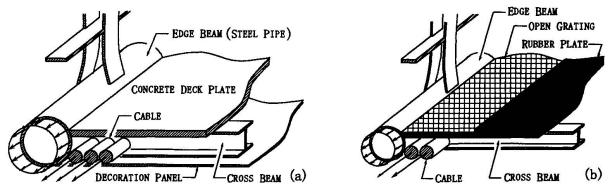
Cross-sections of the previously proposed steel structure (a), and the improved lighter steel one (b).
